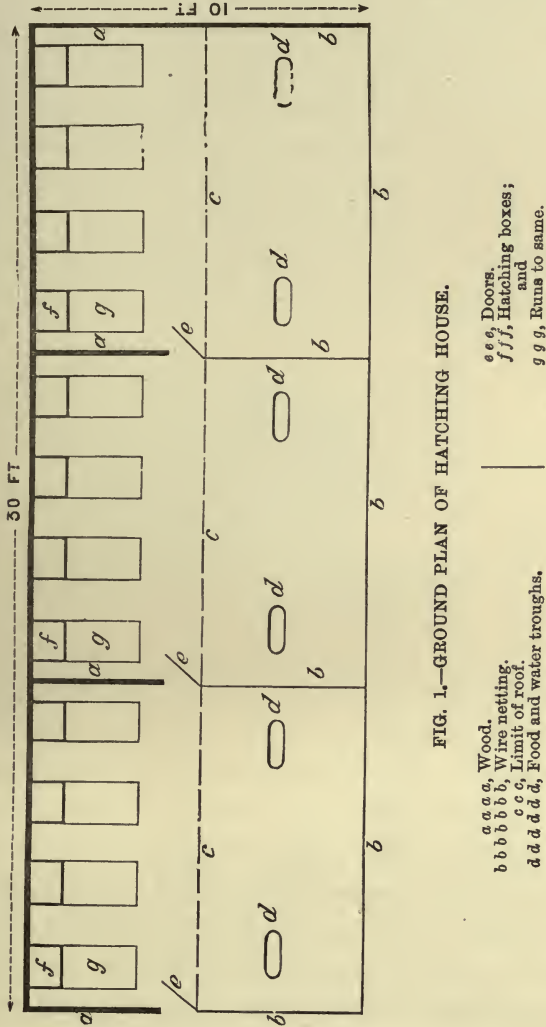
GROUND PLAN OF HATCHING HOUSE.
